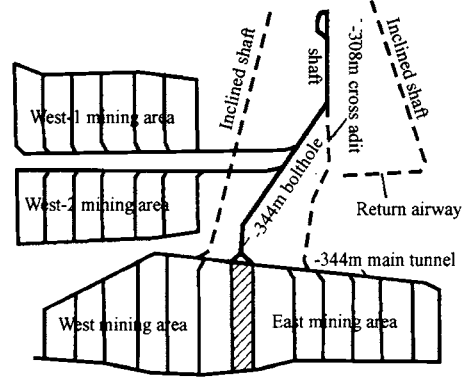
Sketch of -344m mining level and vertical shaft excavating
